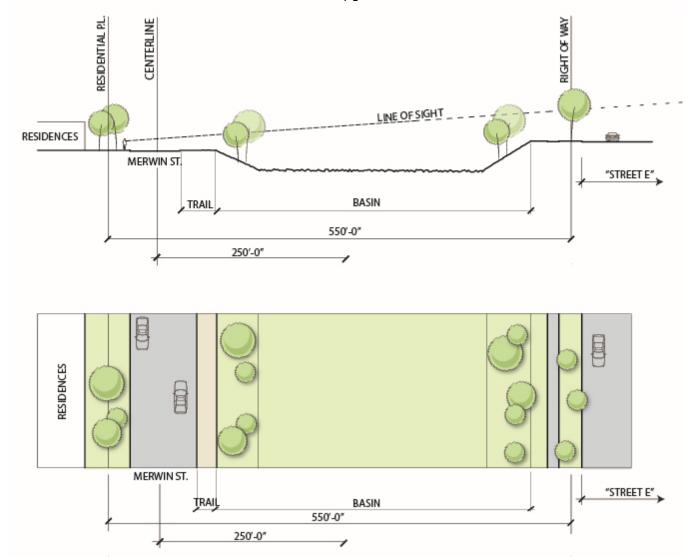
, 4-10 Bay Avenue Section D and Plan View D (pg.4-8)
